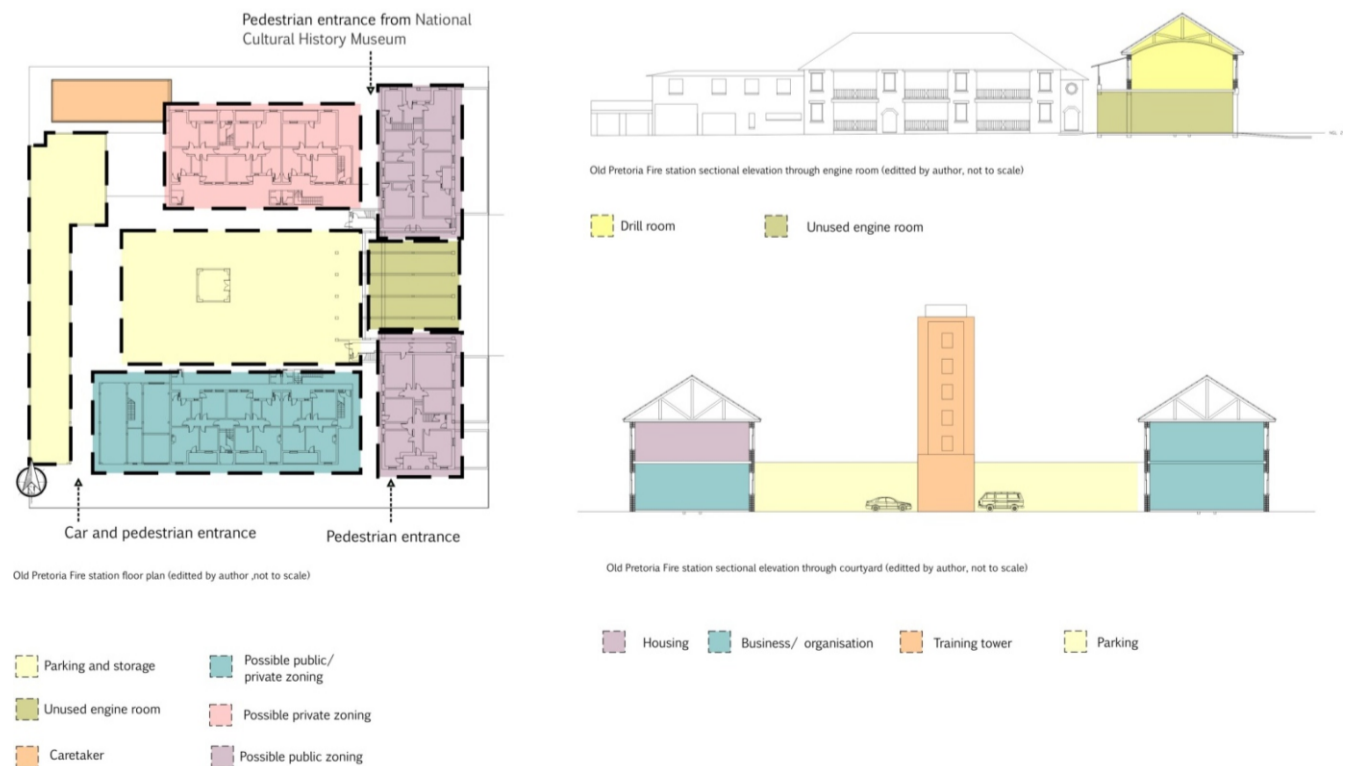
Old Pretoria Fire station floor plan and sections (edited by author, not to scale)
